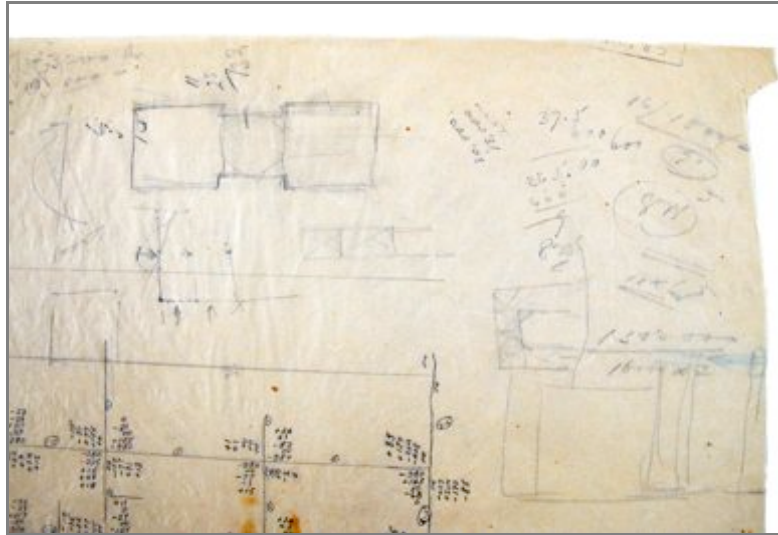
Detail Unnumbered Engineering Sheet, Gummer W. J. & C. R. Ford, Building Queen Street for Dingwall Trust, (1934), Gummer & Ford Collection, GF6, Architecture Archive, University of Auckland Library. 640 x 480 graphite on butter paper.
